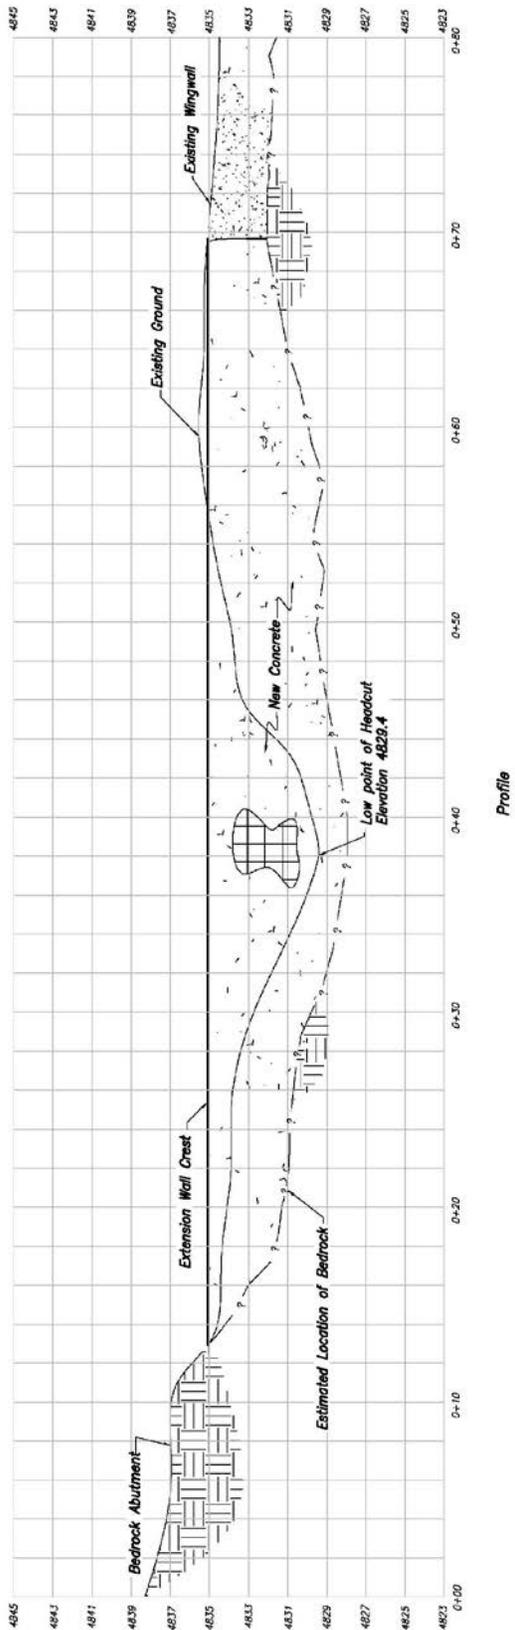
Profile view of proposed wing wall extension at upper BLM dam.
